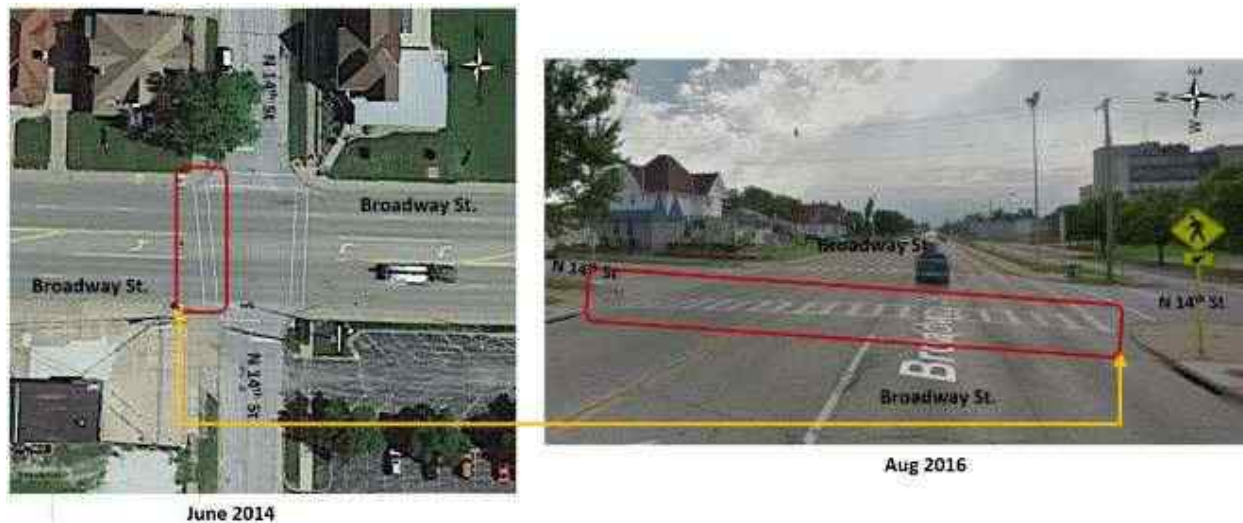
The type of crosswalk striping across Broadway St. (in 2014 and 2016).
